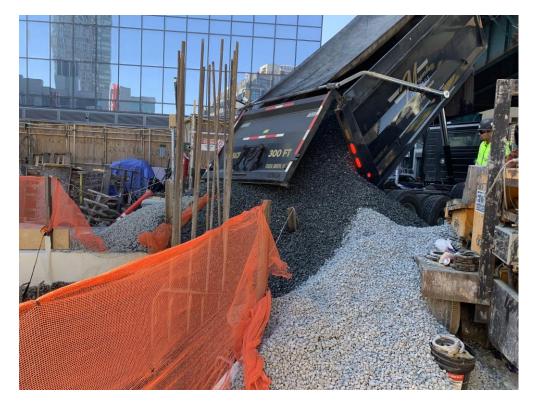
View of ECD stockpiling imported 0.75-inch stone in COMP A (facing northeast).
